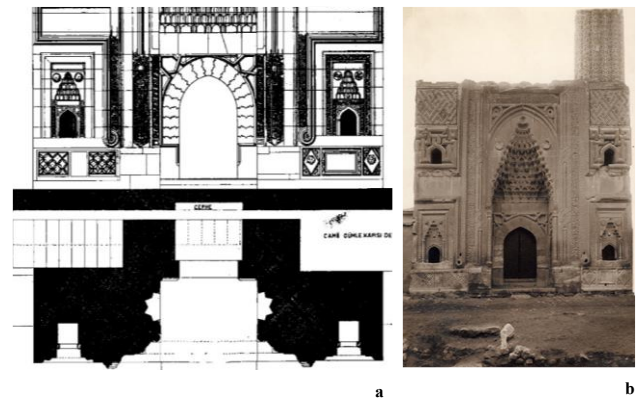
Wall Fountain of the Sâhip Ata Mosque. a- The location of the wall fountain in plan and elevation view [36], b- The monumental portal (*taç kapı*) and wall fountain [37]
